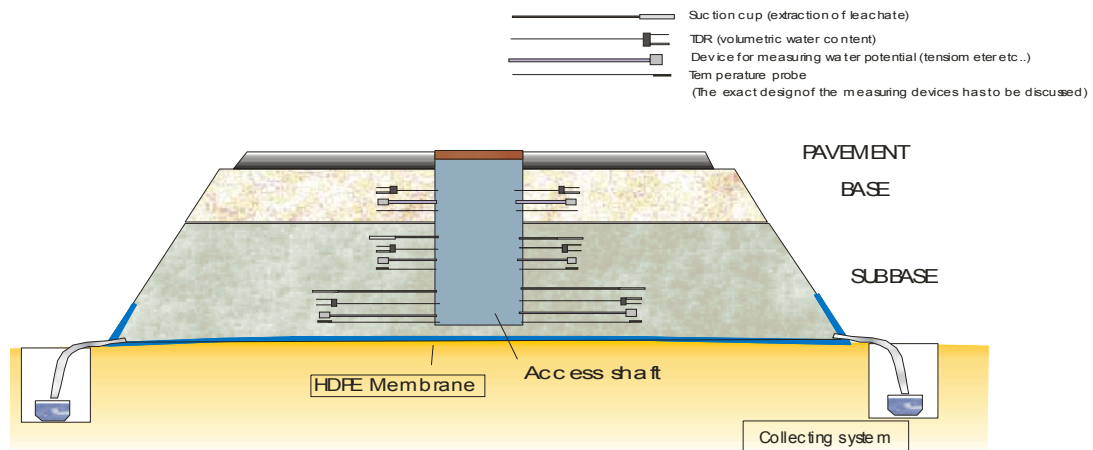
Section 3 of the trial embankment (figure is not to scale)
